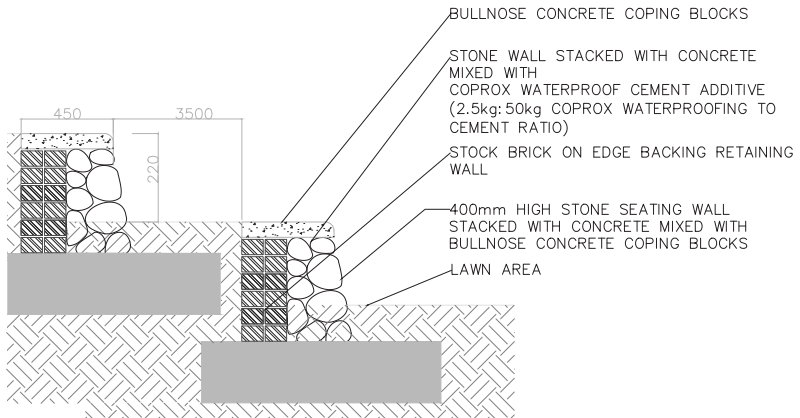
Detail 7-Stepped lawn, concrete and stone amphitheater detail - not to scale (Author: 2013)
